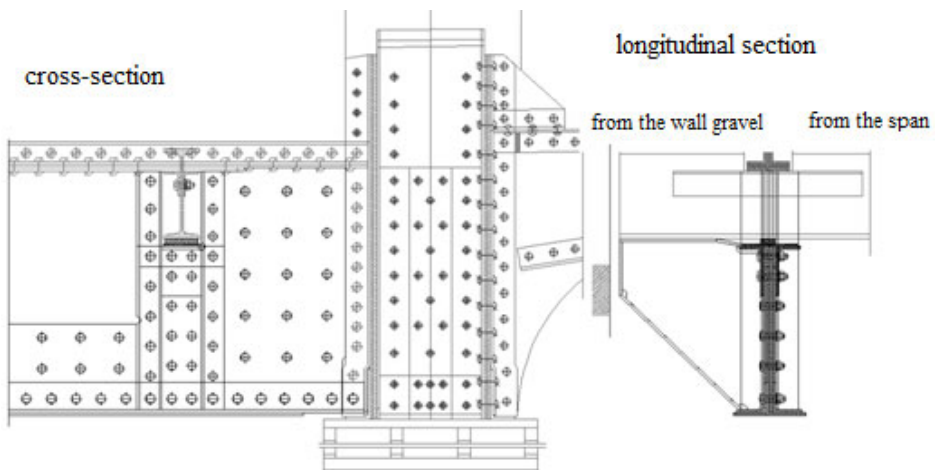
Support crossbeam after strengthening and cantilever in line of longitudinal beam next to abutment.
